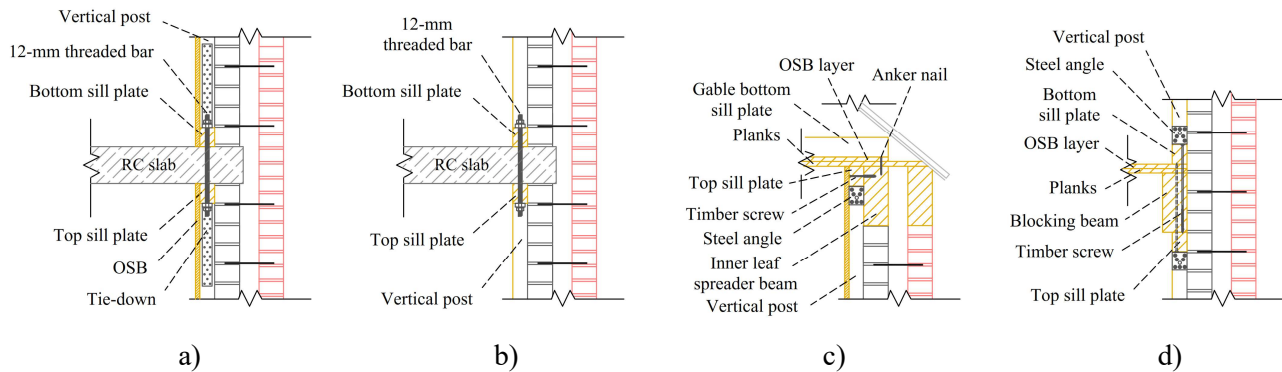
Connection details: a) longitudinal walls-to-first floor; b) transverse walls-to-first floor; c) longitudinal walls-to-second floor; d) transverse walls-to-second floor.
